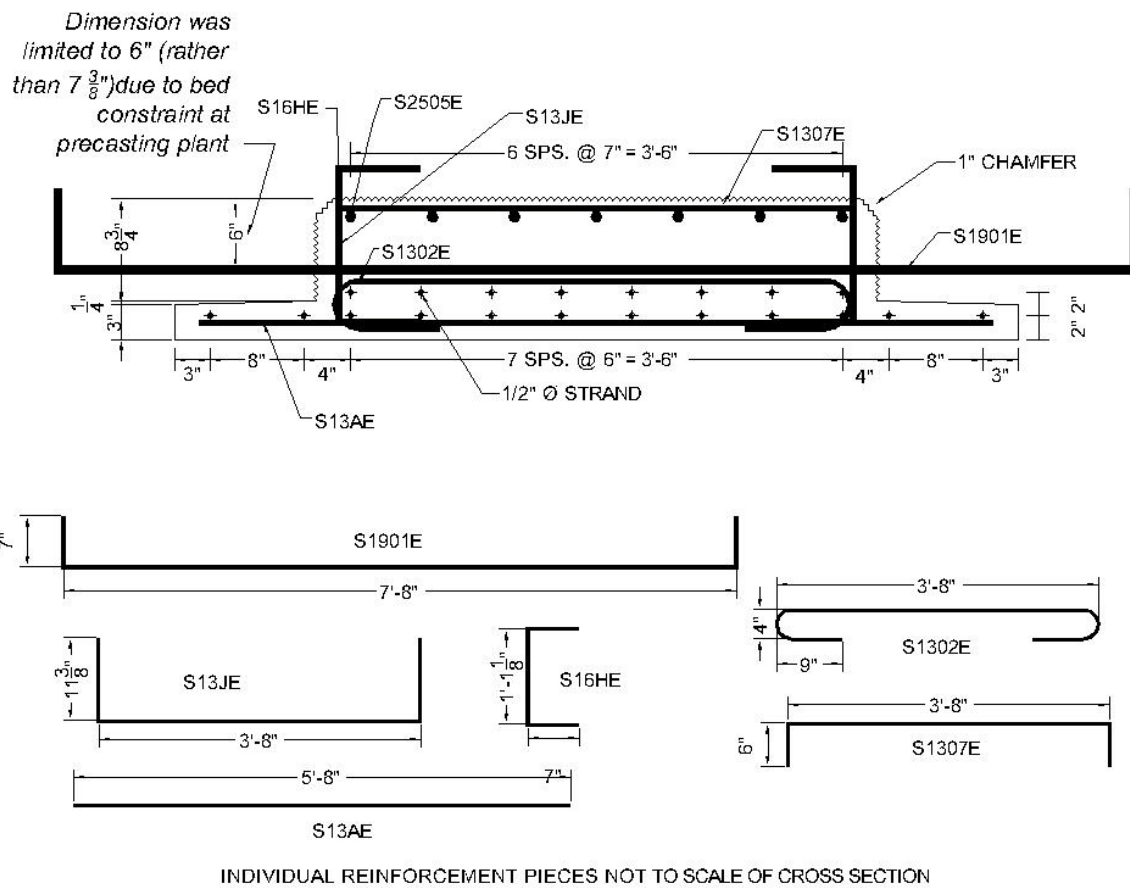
Cross section and individual reinforcement details for the east end of precast beam 1N
